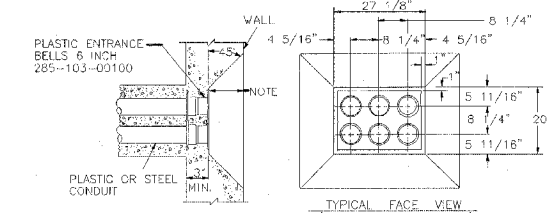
MANHOLE ENTRANCE WITH PLASTIC TERMINATORS (OLDER STYLE) FOR PLASTIC OR STEEL CONDUIT (POCKET TYPE)
